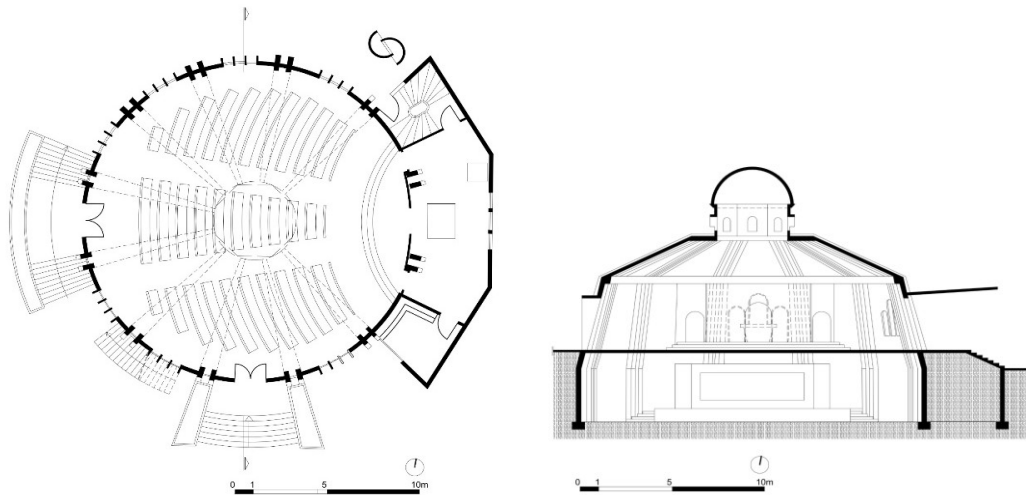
St. George Church plan and section, drawn by the author based on Prist Ilyas Habib
